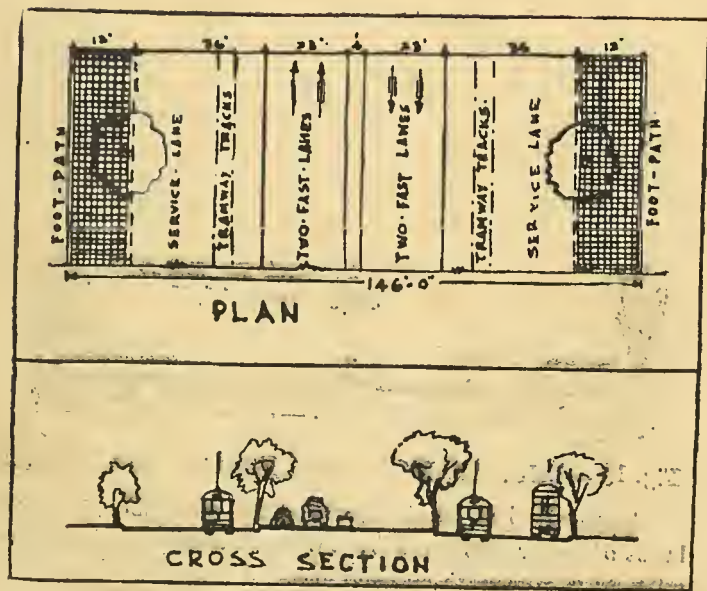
TYPE DESIGN FOR 146 FT. ARTERIAL ROAD CARRYING TRAMLINES PROPOSED IN GREATER BOMBAY MASTER-PLAN
